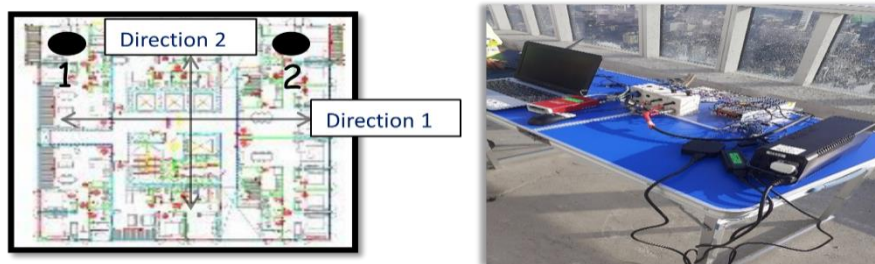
Arrangement of two accelerometers on the top floor of the Twin Peak building.
